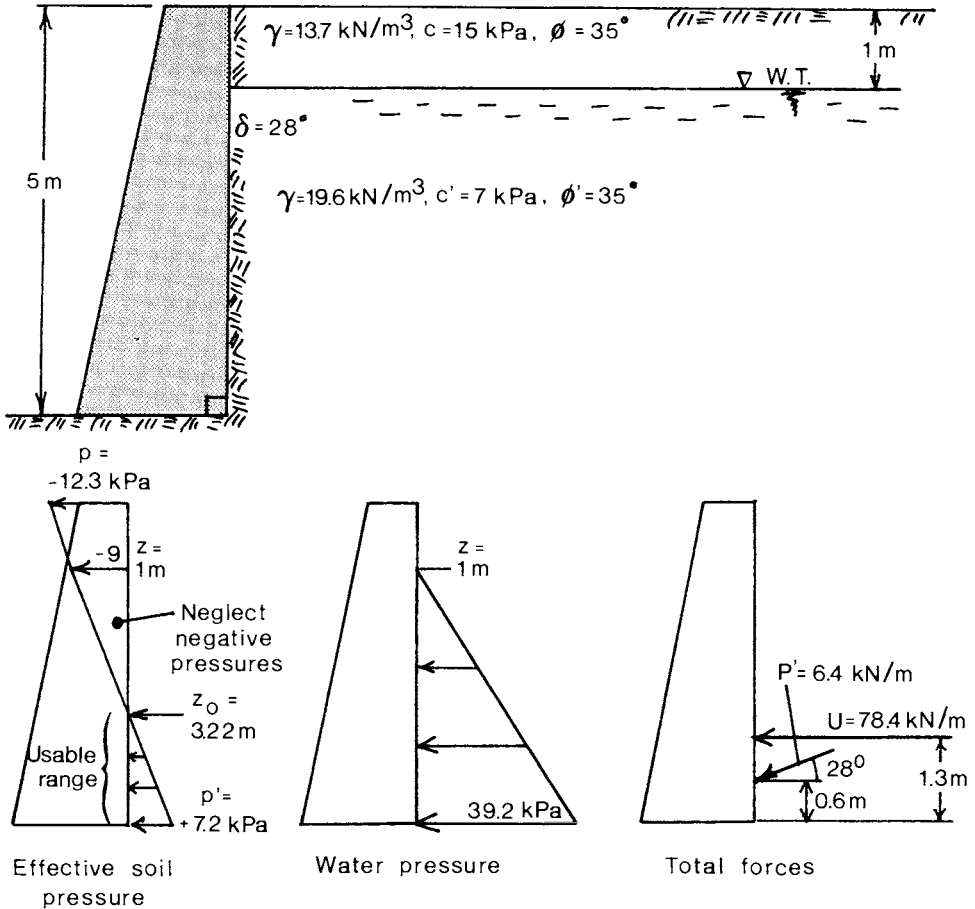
(a) A level water table in soil behind a retaining wall. (b) The calculation of total wall pressures for the active failure case.
